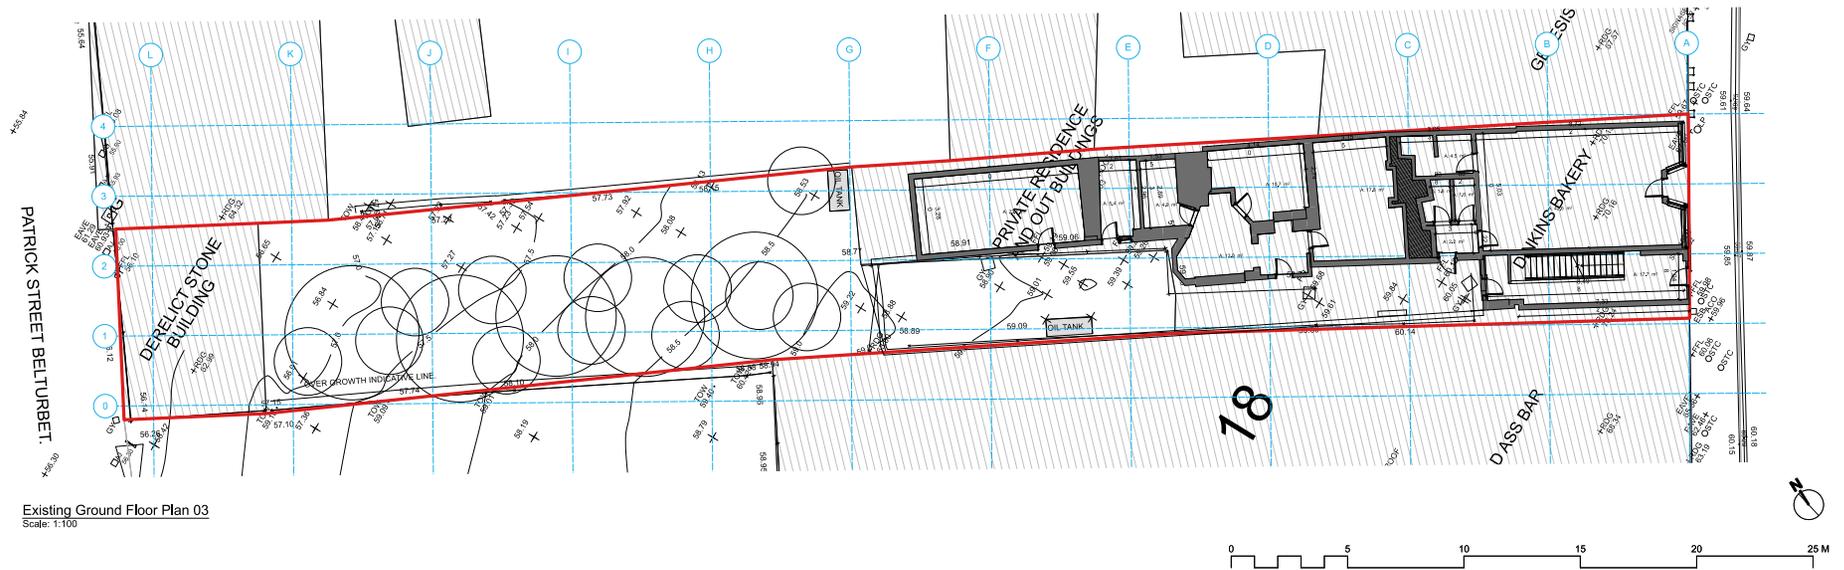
Existing Ground Floor Plan. Drawing by Cooney Architects
